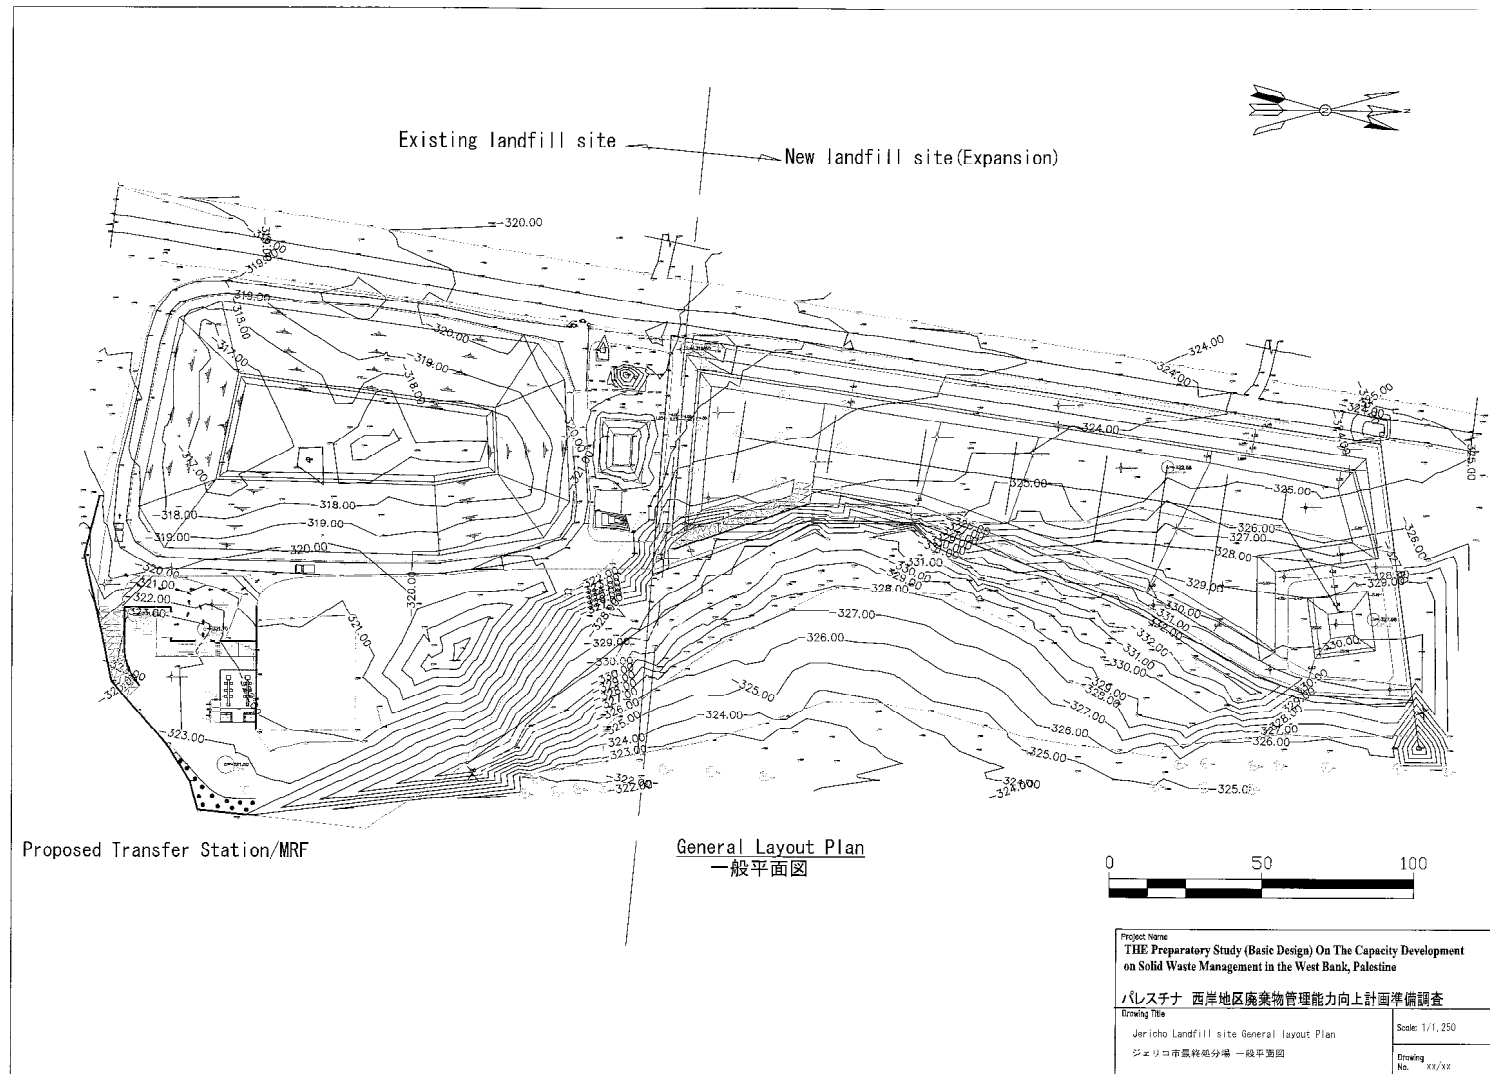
General Plan of Sanitary Landfill Expansion in Jericho
